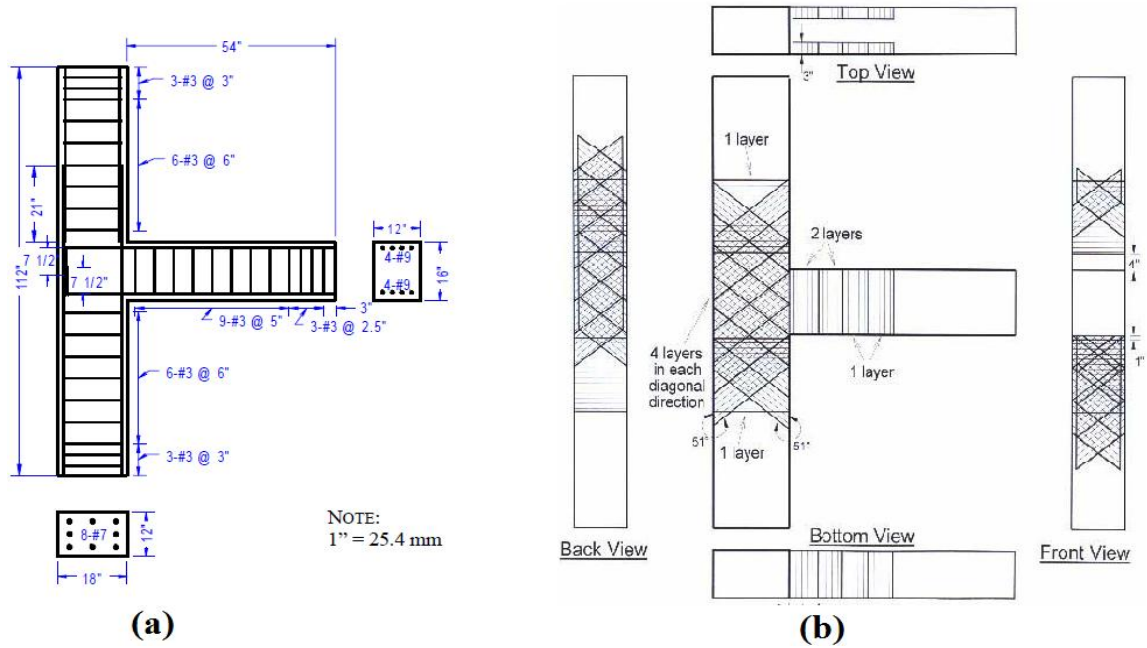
(a) Specimen Dimensions and Reinforcement Details (b) Composite Retrofit Layout [2]
